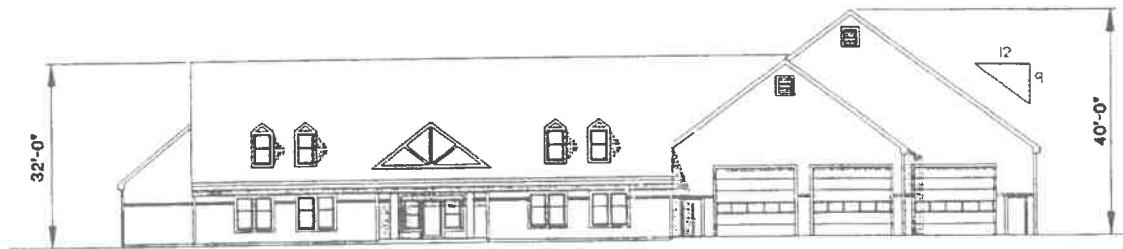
Front Elevation of Station with Roof Heights Indicated
